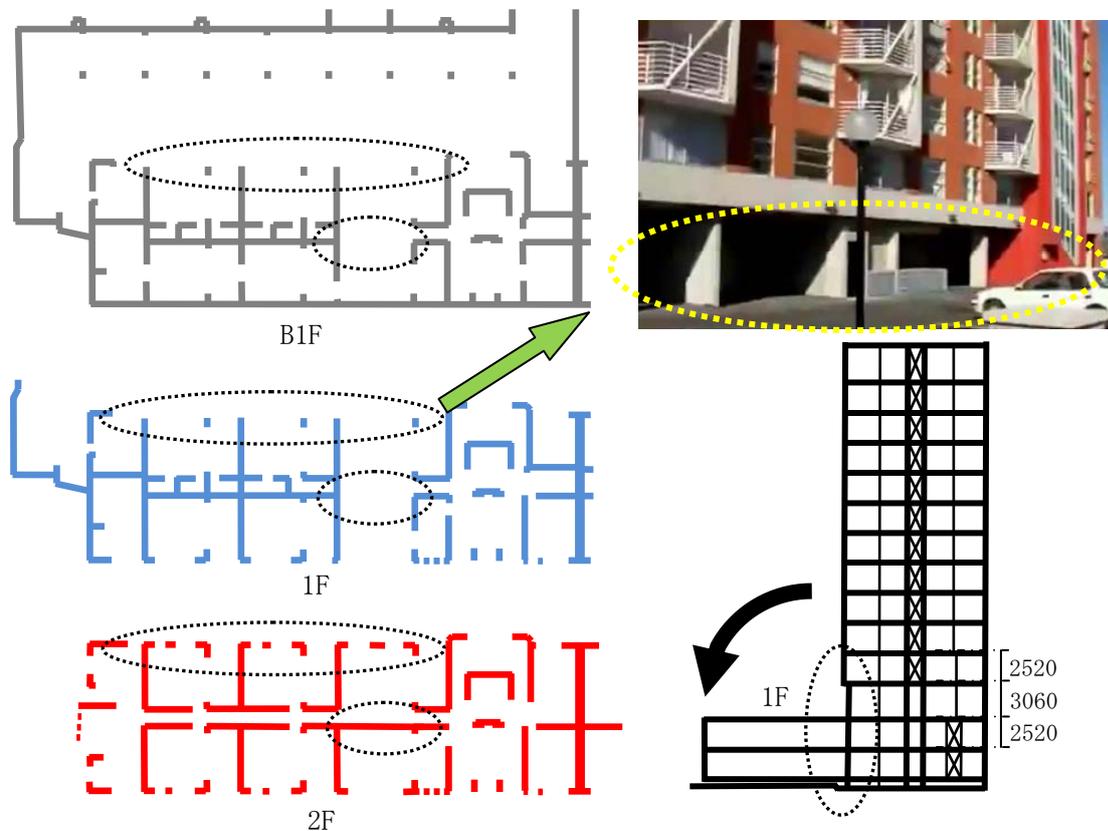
Difference in wall volume and layout among basement, first floor, and second floor
